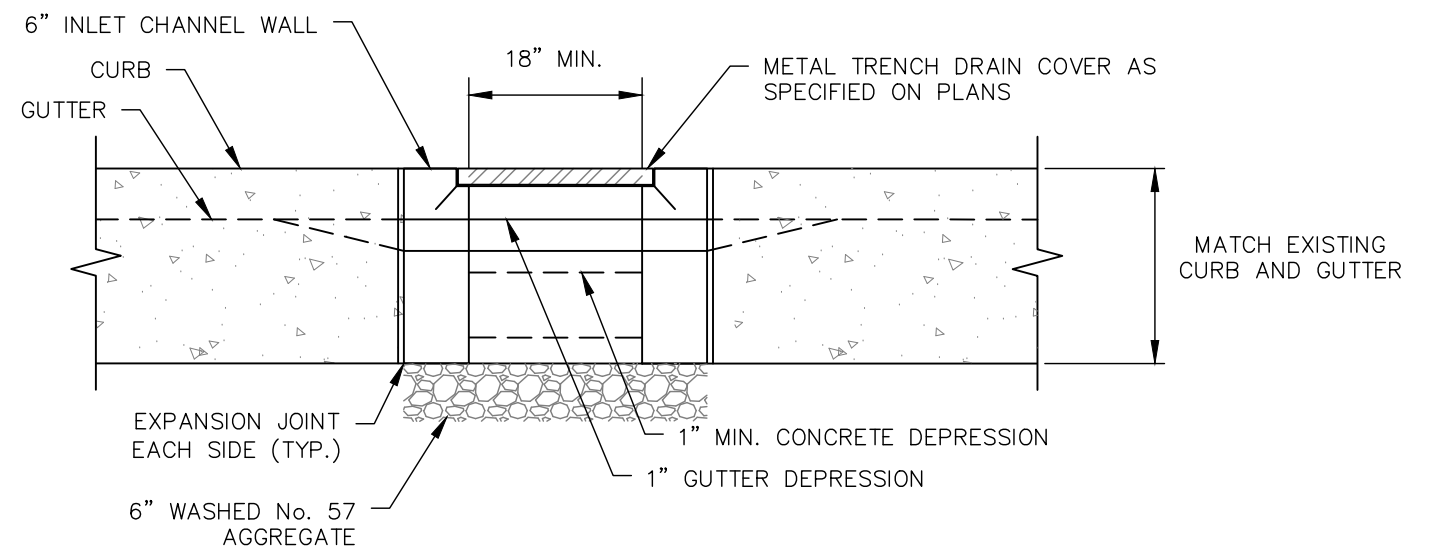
A SCALE: N.T.S SHEET No. 15
